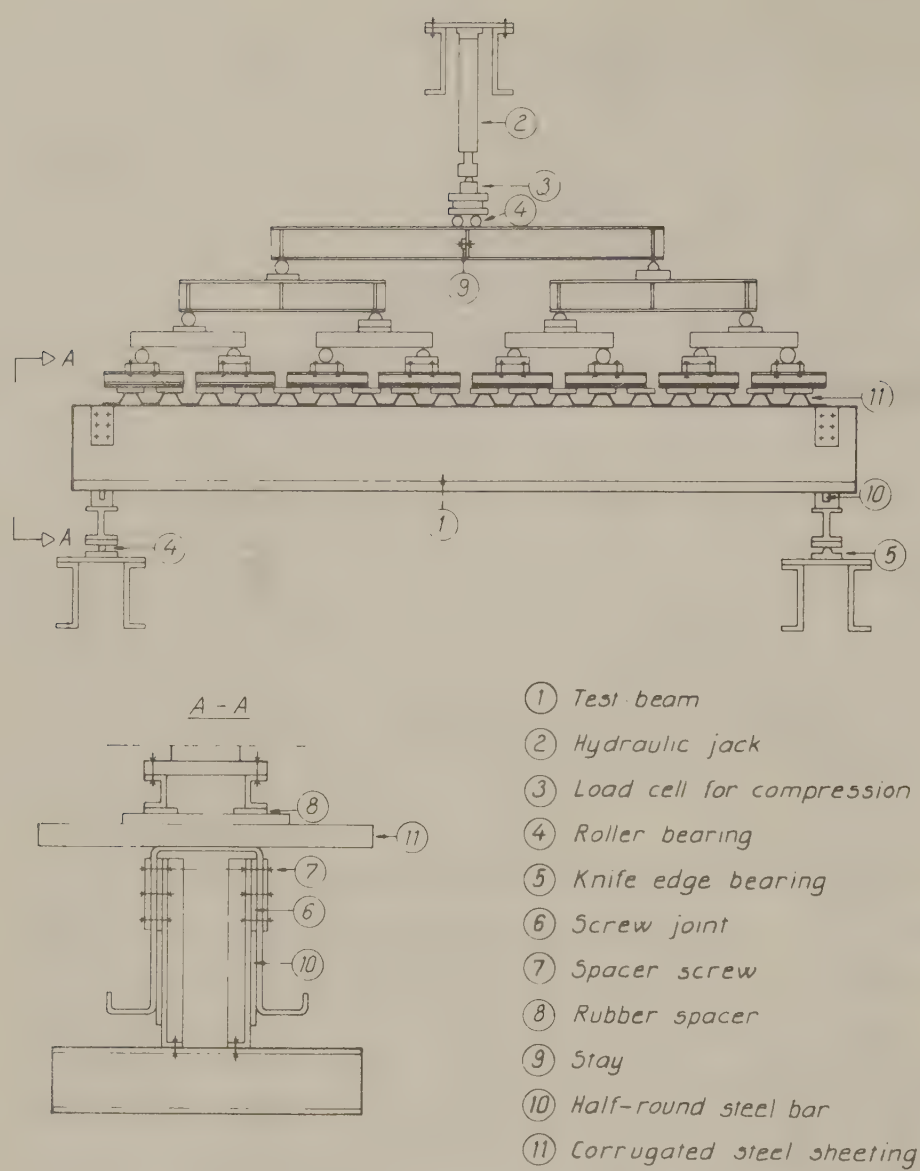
Details from loading and support arrangements for test beams K3 and K4.
